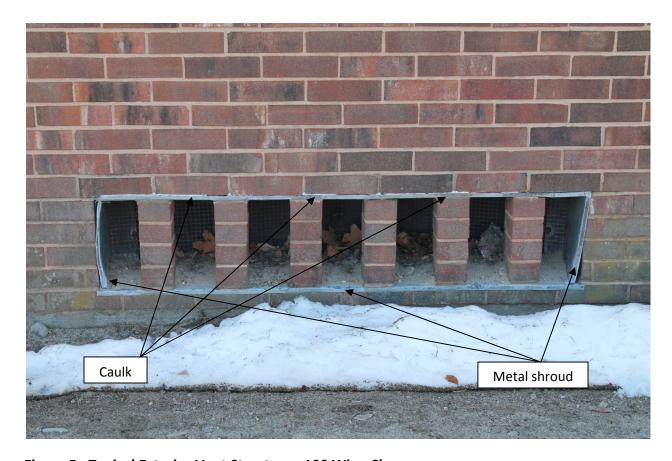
Typical Exterior Vent Structure: 100 Wing Classrooms.
